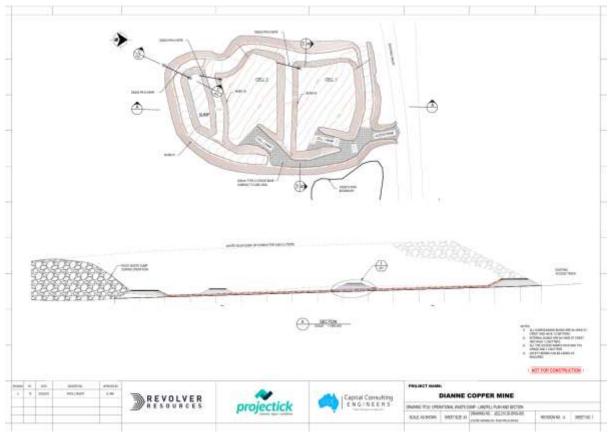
Predicted Landfill Layout – Plan and Cross Section
